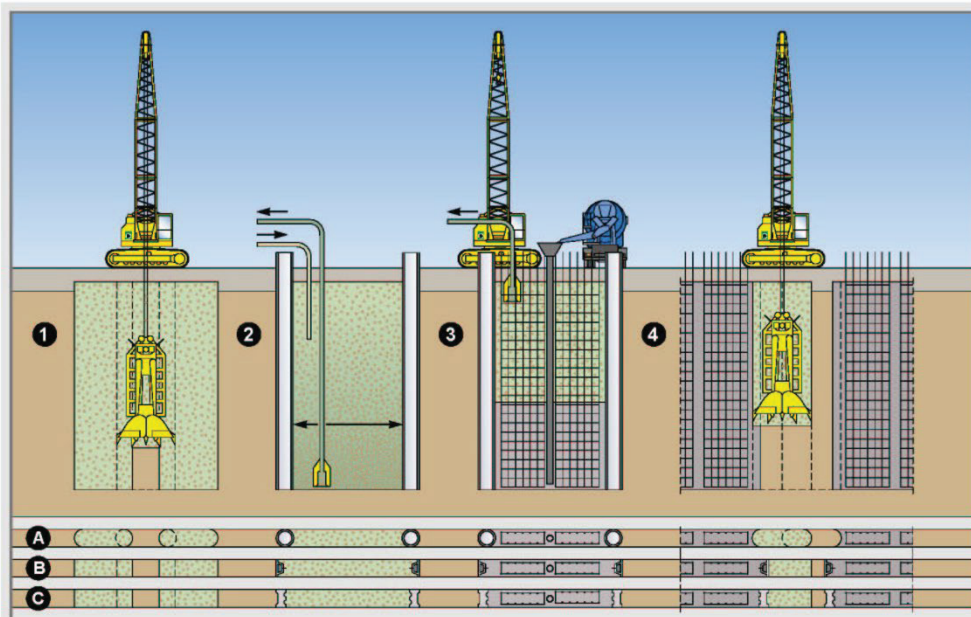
Diaphragm wall, general construction sequence (Scholz and Linder 2007)
